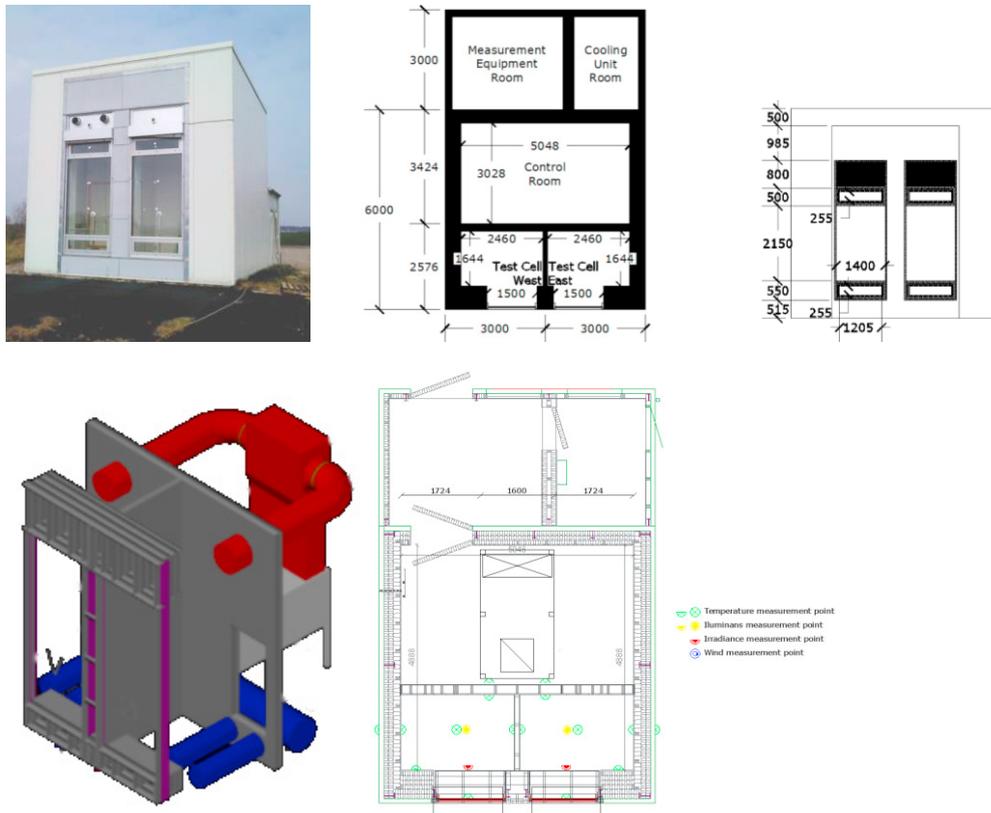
Picture (left), plan drawing (center) and façade view (right) of the test facility in Aalborg.
